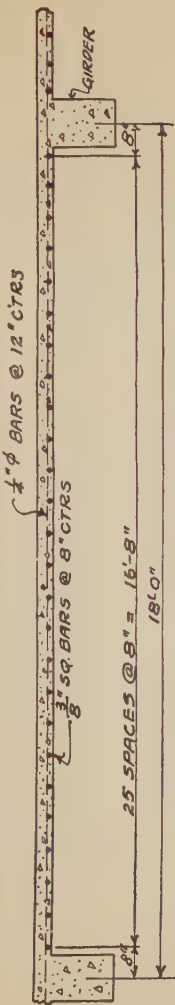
,033.—American section through girder showing typical bar design for slabs.
